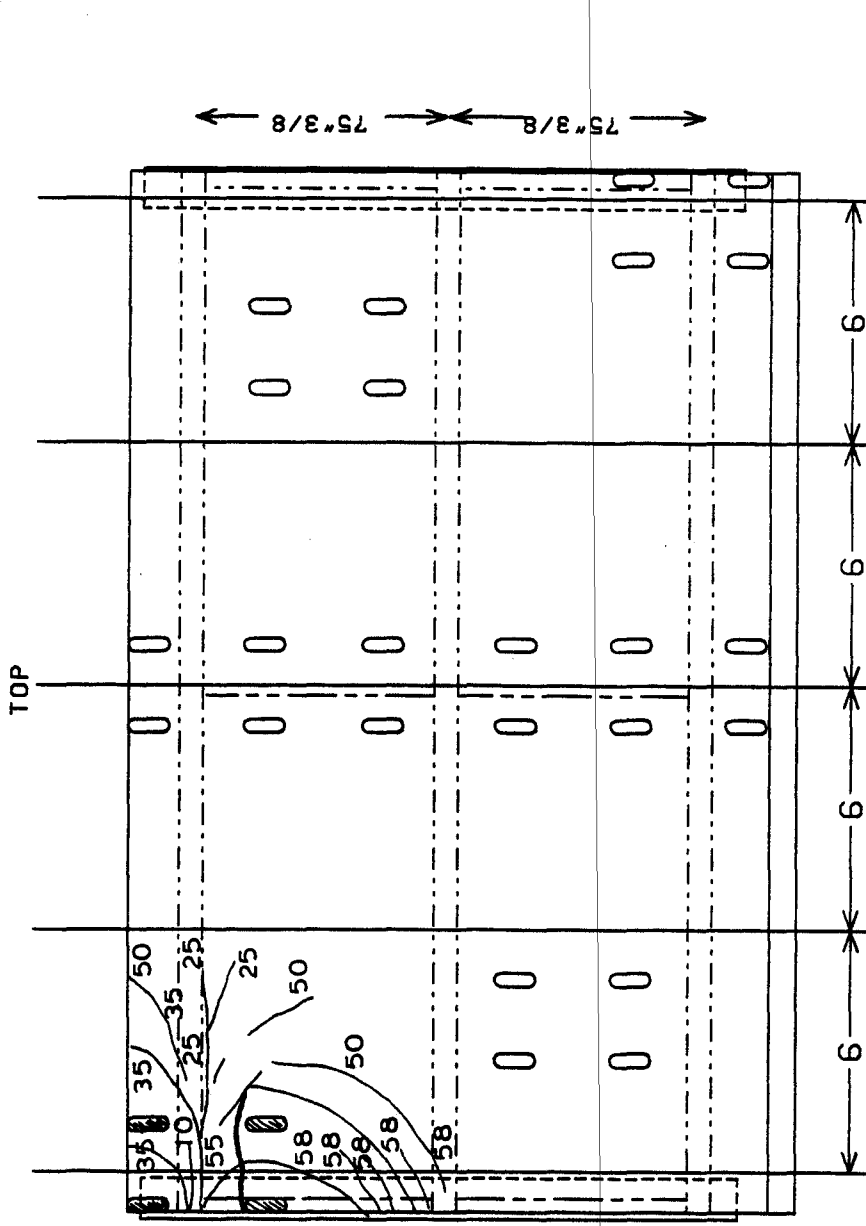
Top Cracking Pattern (Second Bridge - Test No. 5)
